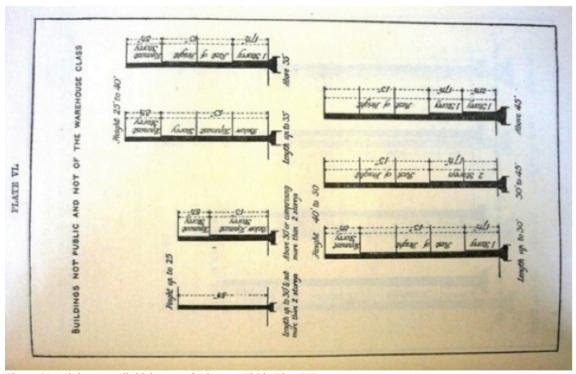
Minimum wall thicknesses for houses (Ibid., Plate VI).
